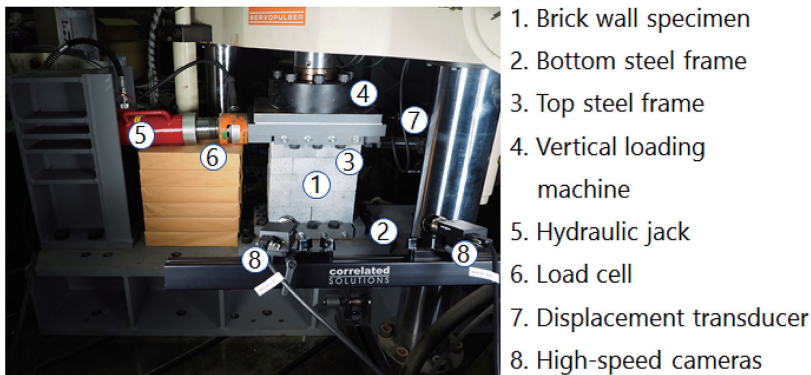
(c) shows the experimental setup. The wall was installed onto a bottom steel frame, which was fixed under a loading machine. The wall's bottom part with a height of 3 cm was covered by the fixed bottom steel frame, and the wall was fixed to the bottom steel frame using four steel
